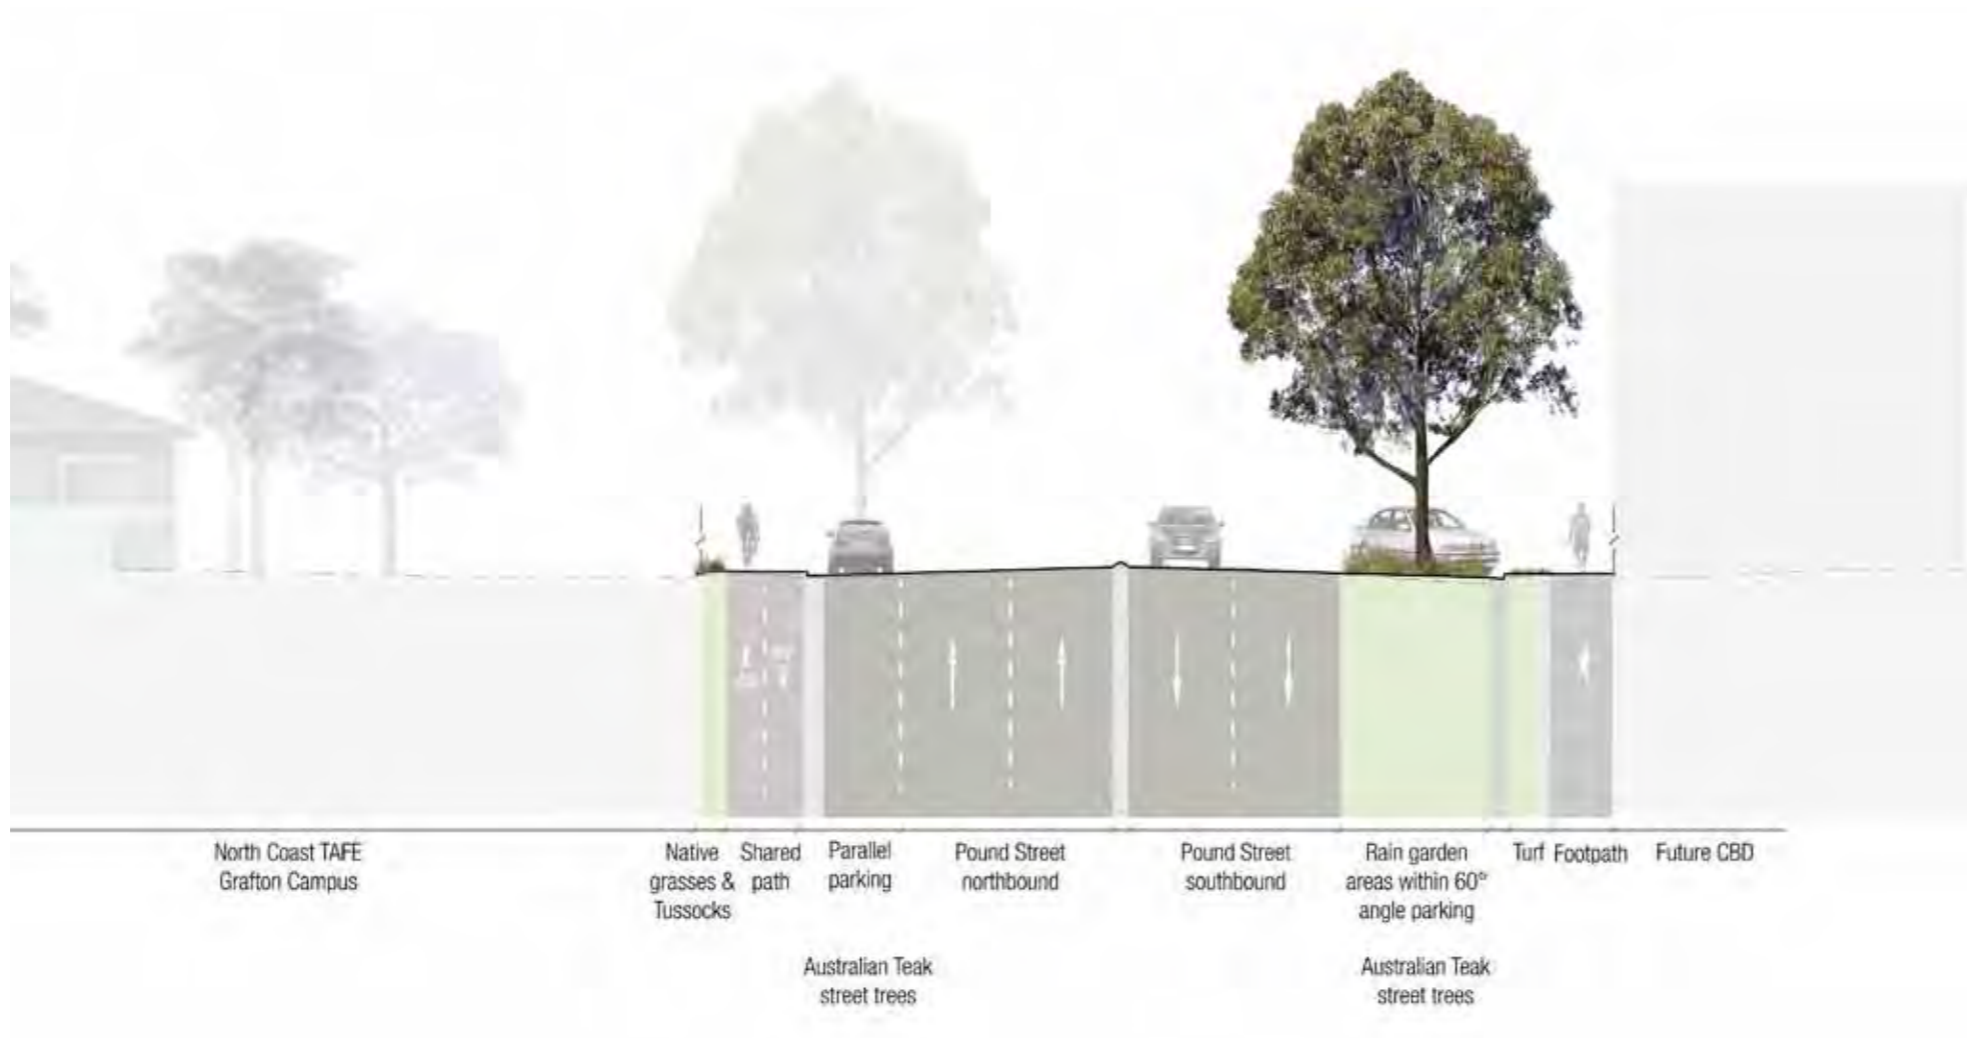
Cross section at Pound Street - Ch 1895 (Scale 1:250)
